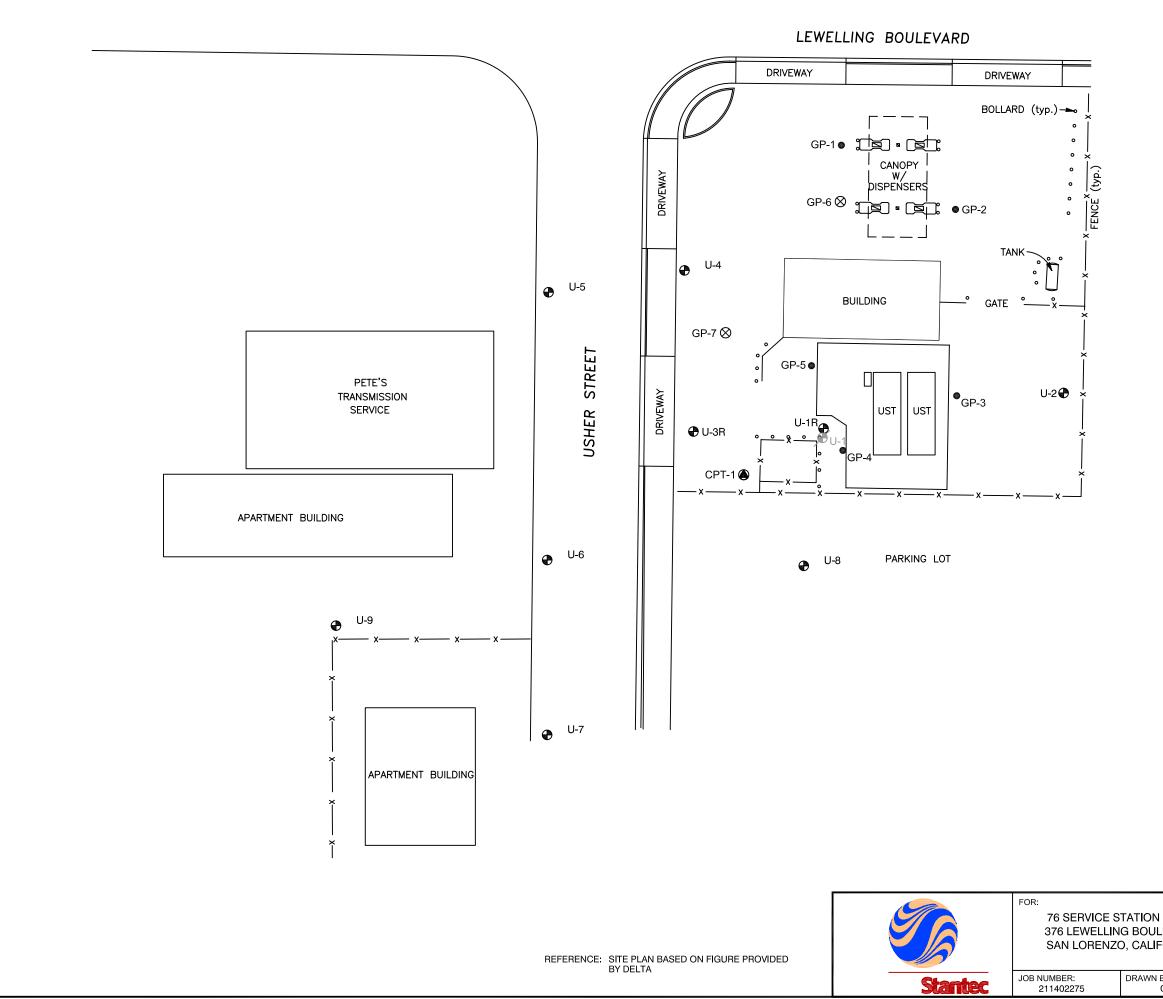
Site Location Map Figure 2 – Site Plan with Proposed Boring Locations
